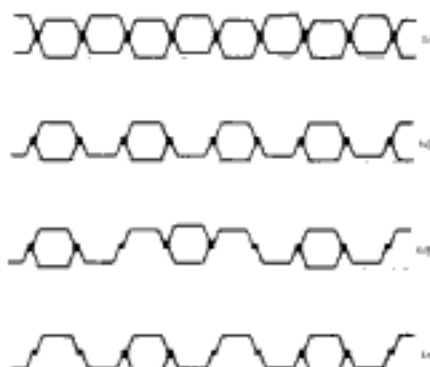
(b) Properties of steel sheet piles produced by British Steel — note that FX sections have similar inter-locks to LX and Larssen 6W sections (courtesy British Steel)
